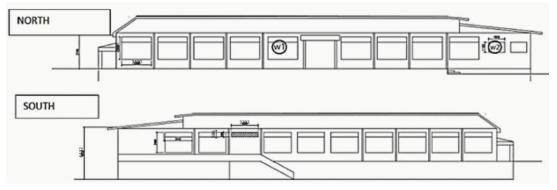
North and South elevations demonstrating the extensive openings of Pentecost church, Bantama
